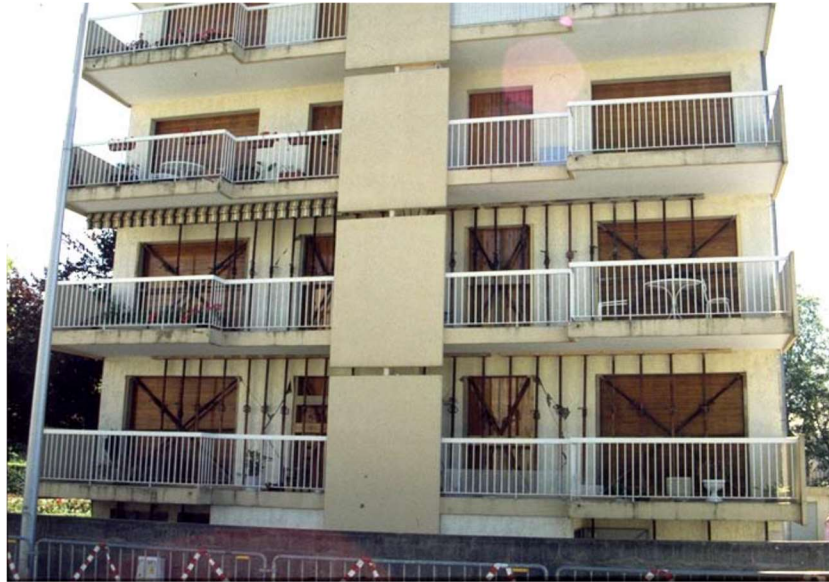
Wide X-cracks on masonry walls of apartments block in Meythet and subsequent shoring of the building. From Davidovici (2008).
